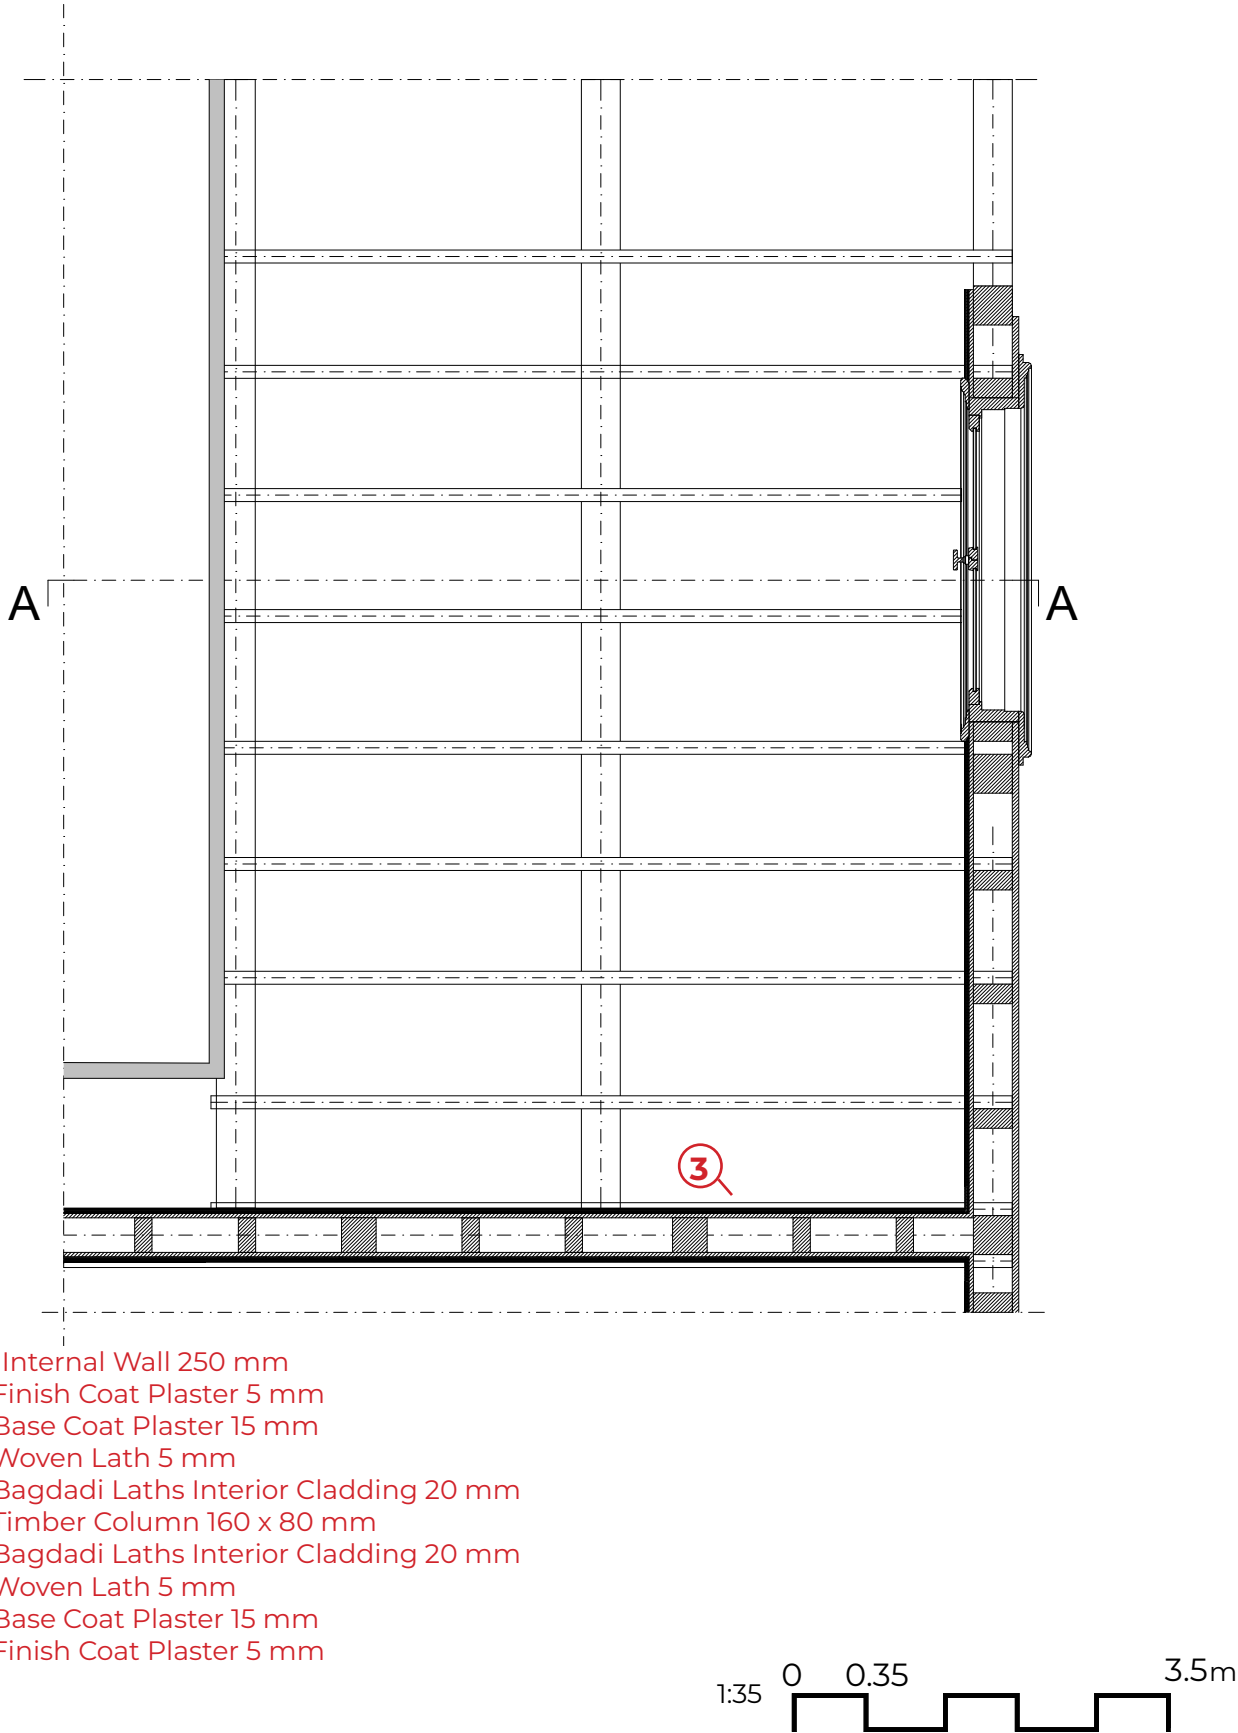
Detail plan of ground floor (Source: Created by the author, 2024)
